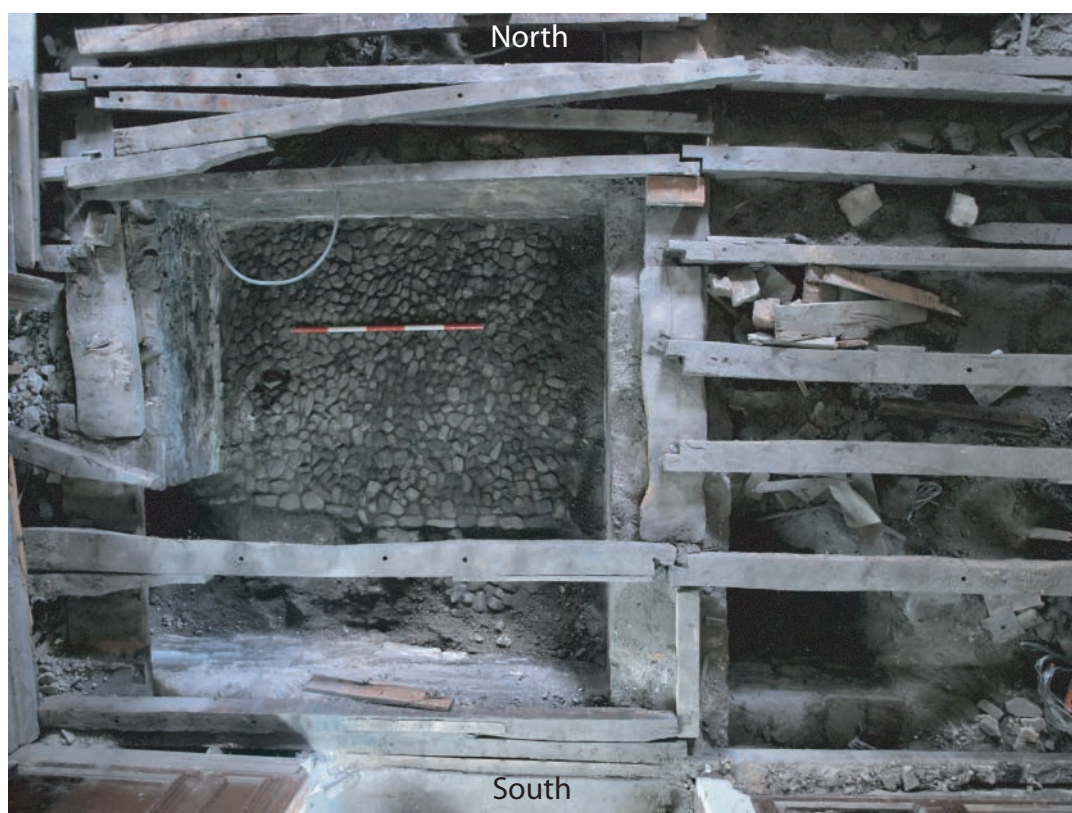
Llanelly House - Sir Thomas Stepney's Study (Room G2). Overhead view showing 'secret' or hidden basement room beneath floorboards. Photo taken through floorboard gap in upper floor. Southern end is at bottom of photo.
